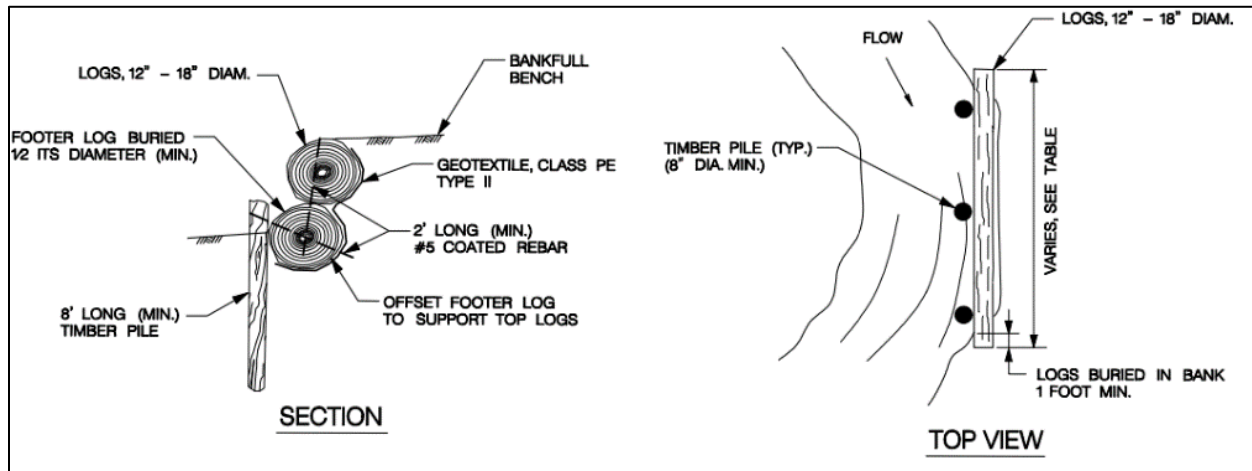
Design detail drawings for log toe from restoration project 28.
